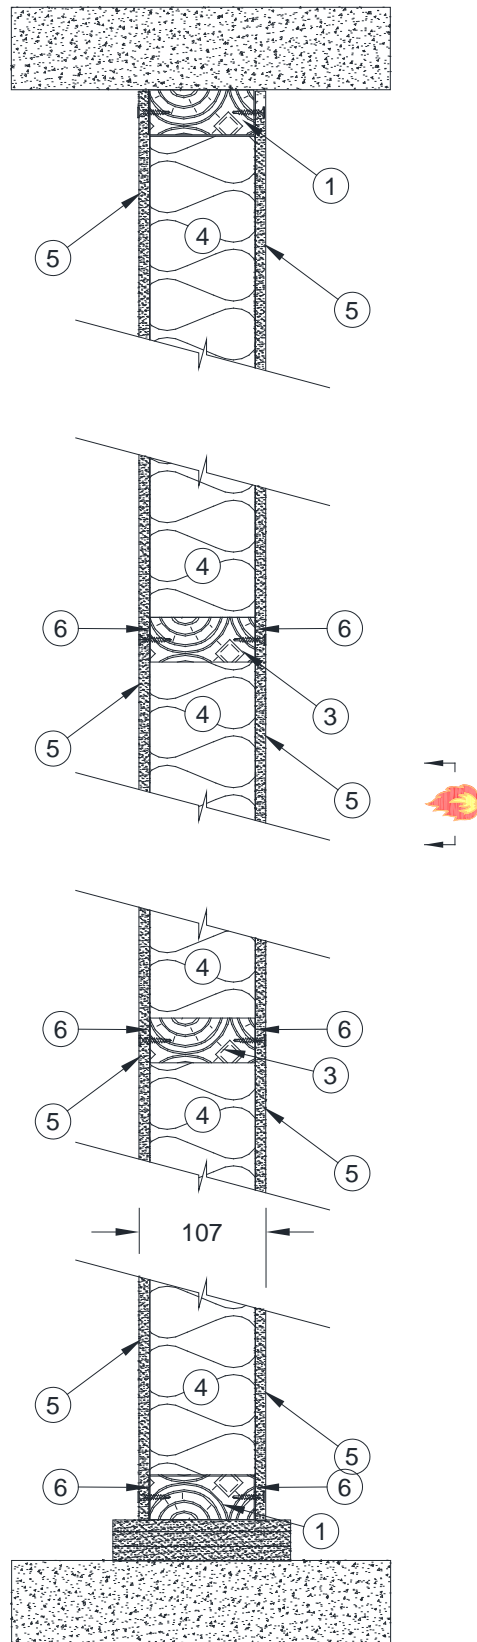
General Elevation of the Framework (Items 1 to 3)
